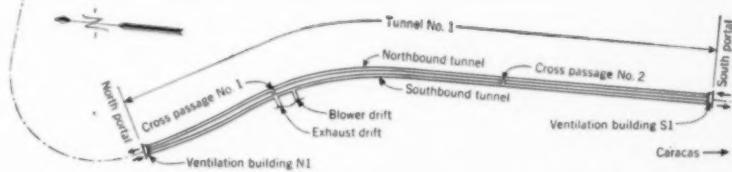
Tunnel No. 1 on Autopista is 5,900 ft long. Tunnel No. 2, about one mile north of tunnel No. 1, is 1,560 ft long. Tunnels have horseshoe section about 29 ft wide by 20 ft high inside of lining.
